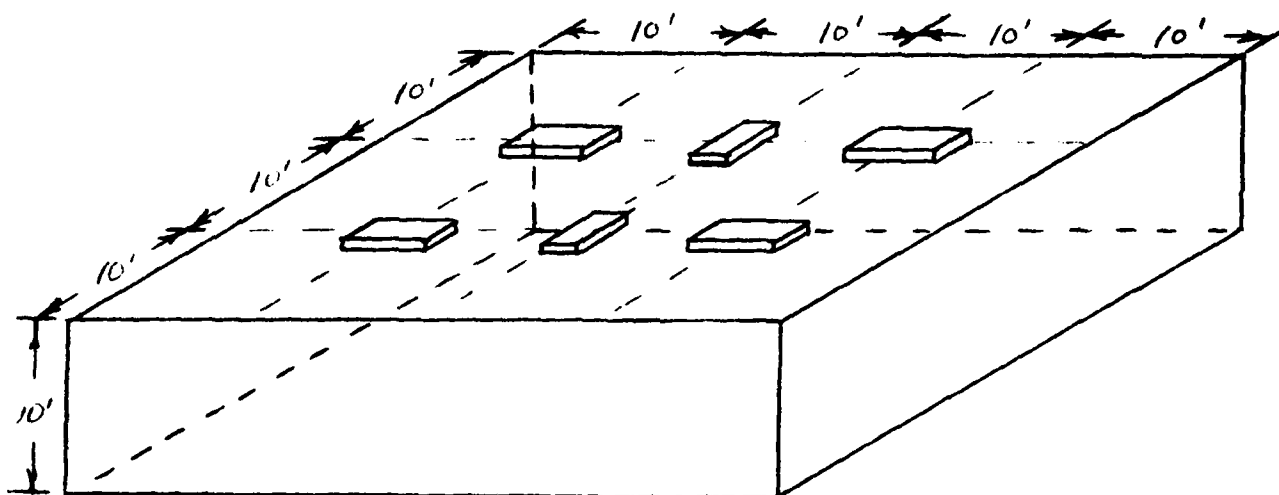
Layout for Example 3. Outside columns of luminaires are 'HB61'; center column of luminaires are 'HB57'.
